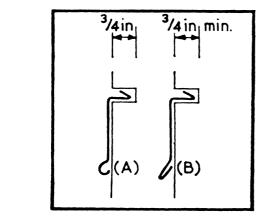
Sections of cover flashing (A) beaded (B) welted
